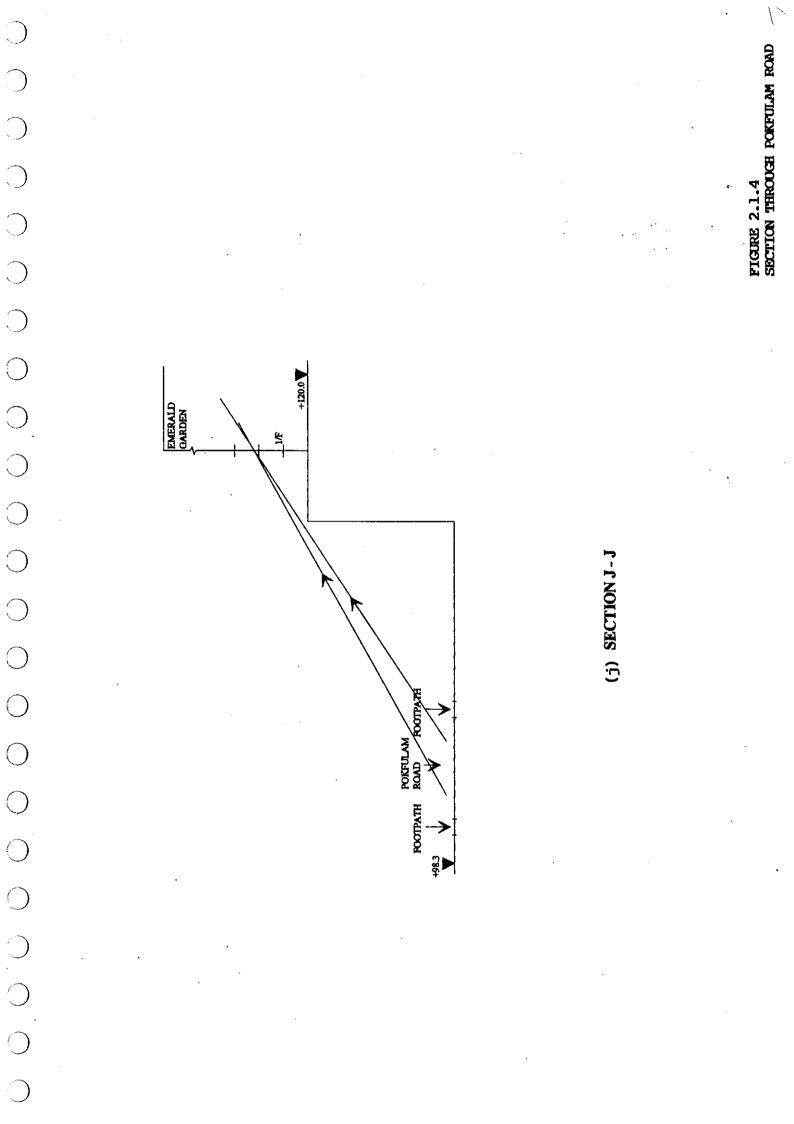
SECTION THROUGH POKEULAM ROAD
